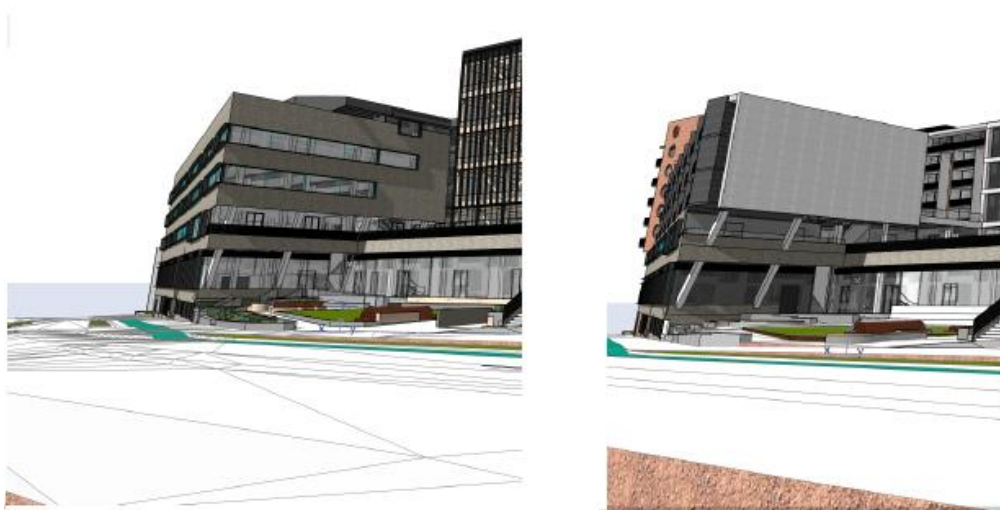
Original proposal (left) and cinema screen wall of current amendment (right)
